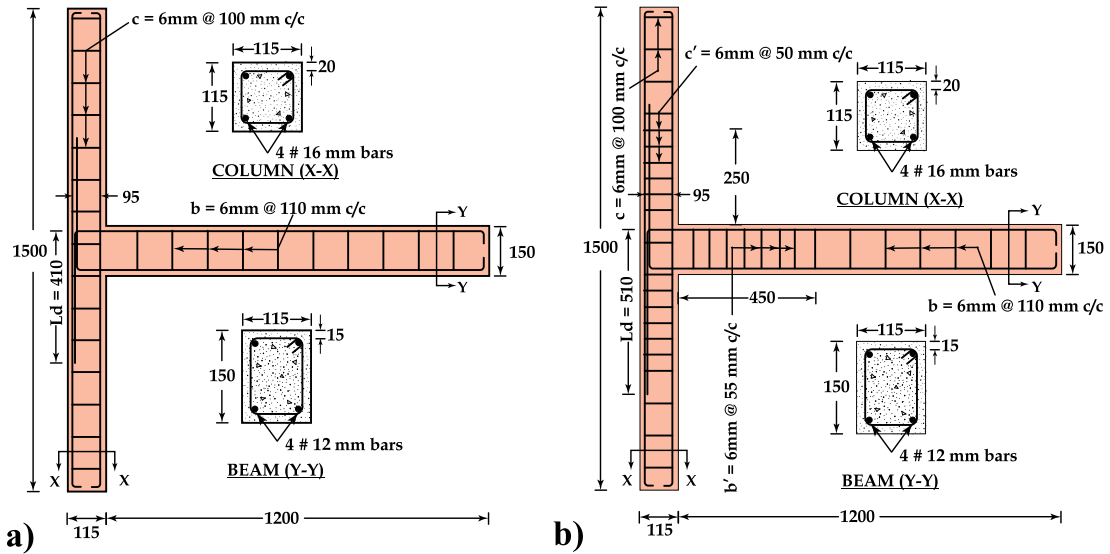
Beam-column joint geometry and reinforcement detailing: a) Non-seismic (NS), and b) Seismic (S) specimen at half-scale
